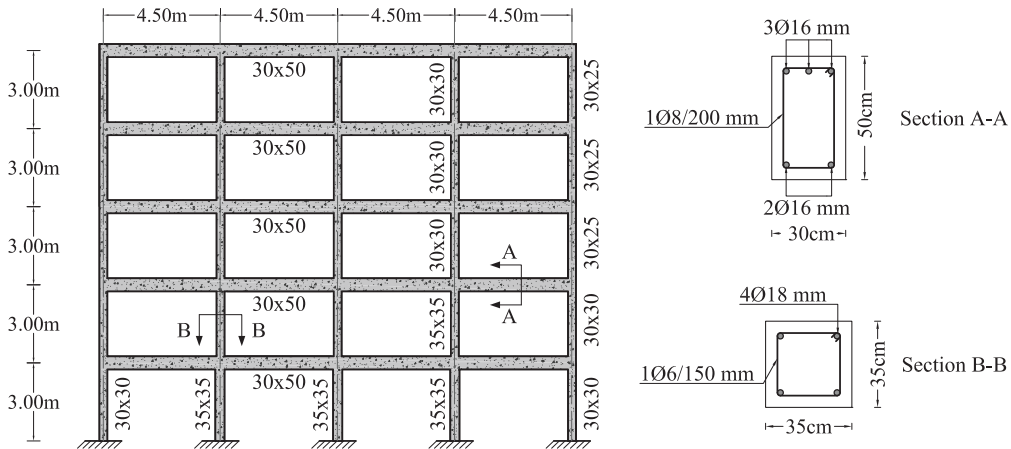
Layout of the case-study frame and sample cross sections (section dimensions are in centimeters).
